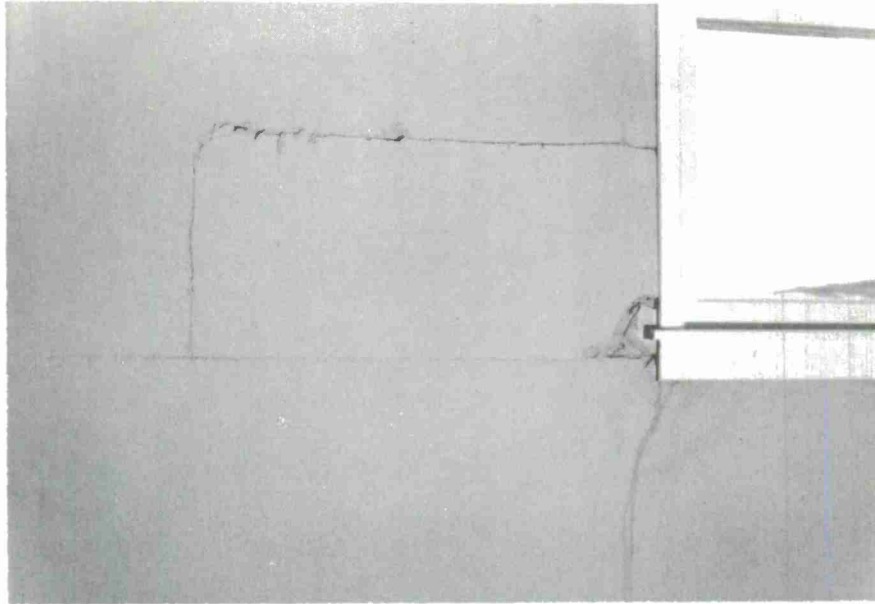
Pretest Plaster Cracks, South Bedroom, Front Window
